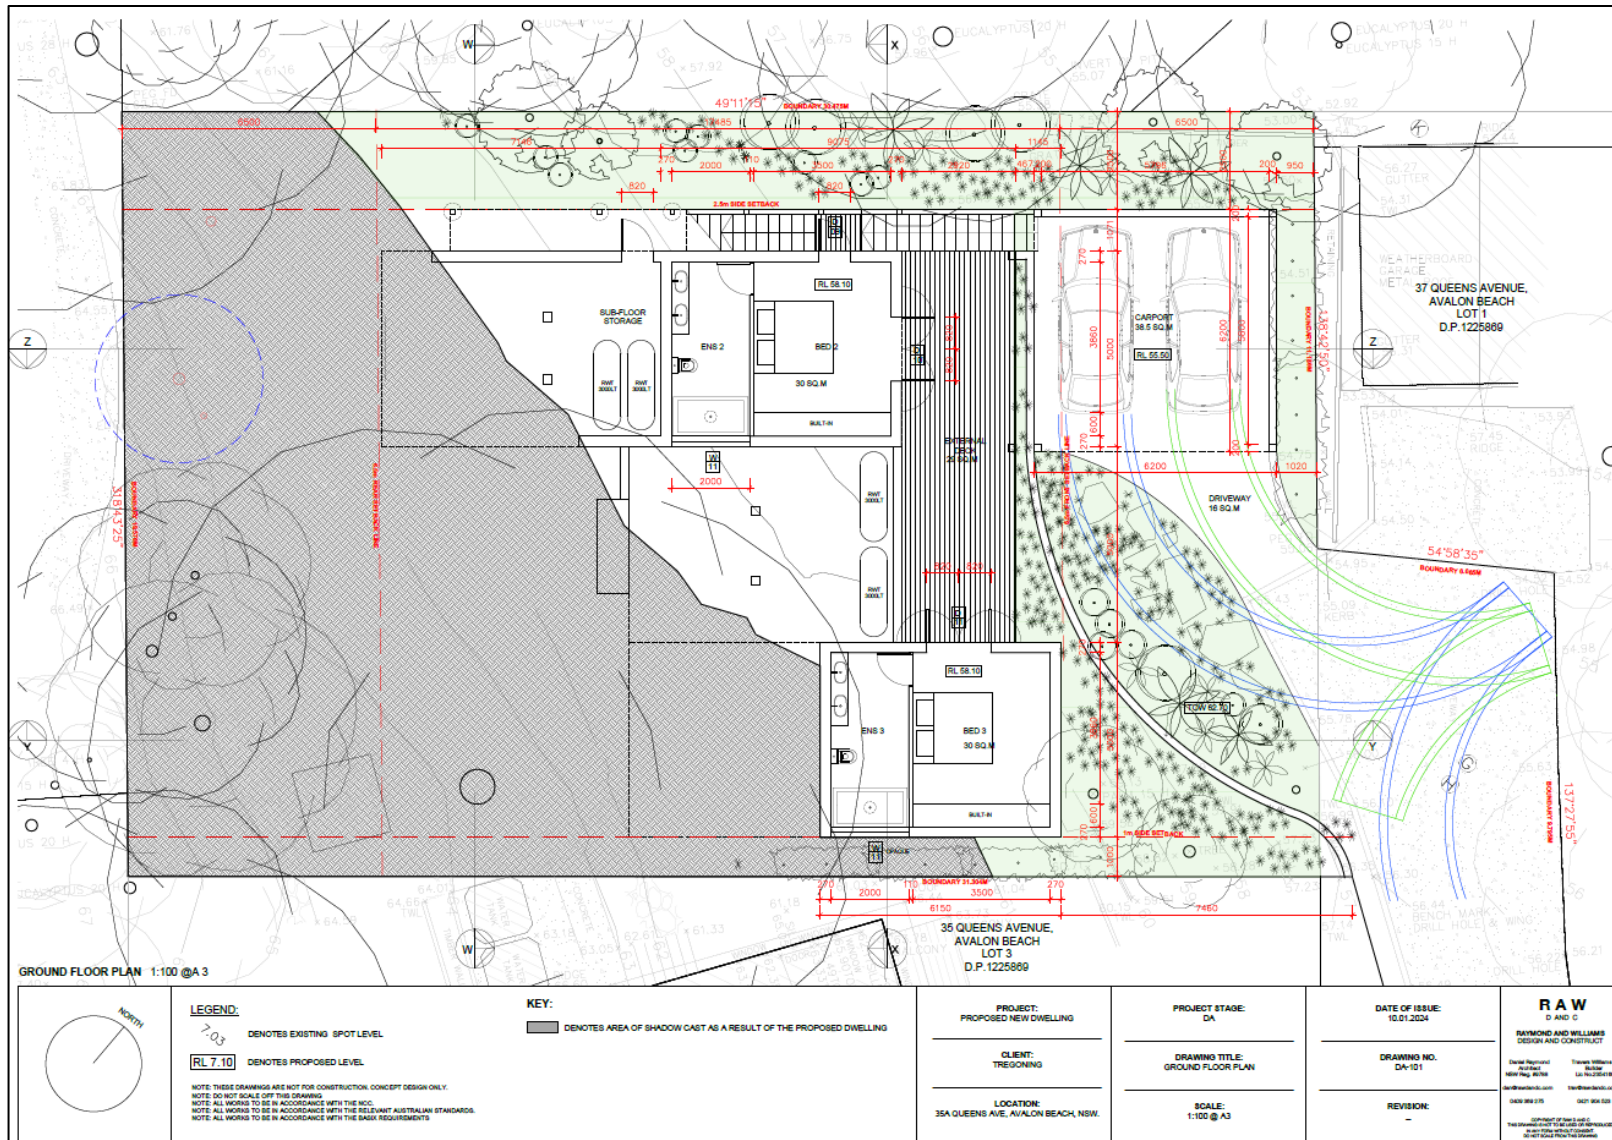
ILLUSTRATES PROPOSED GROUND FLOOR PLAN
